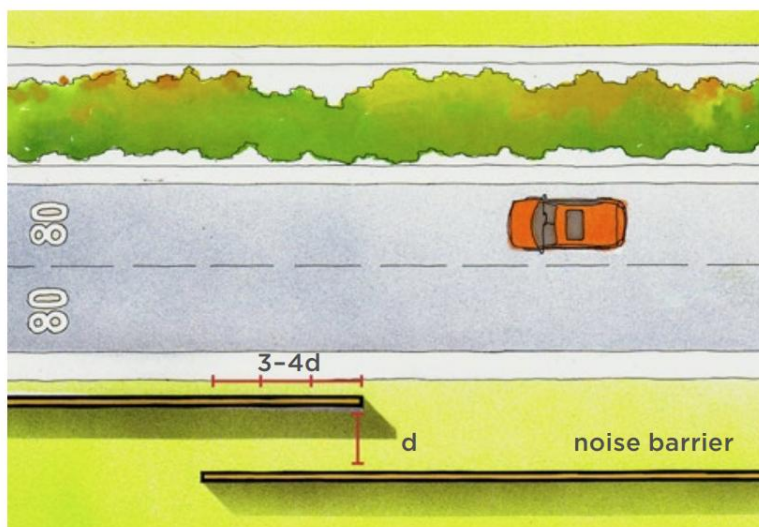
Overlapping Opening in Noise Barrier (Source: TfNSW Noise Wall Design Guideline, June 2023)
